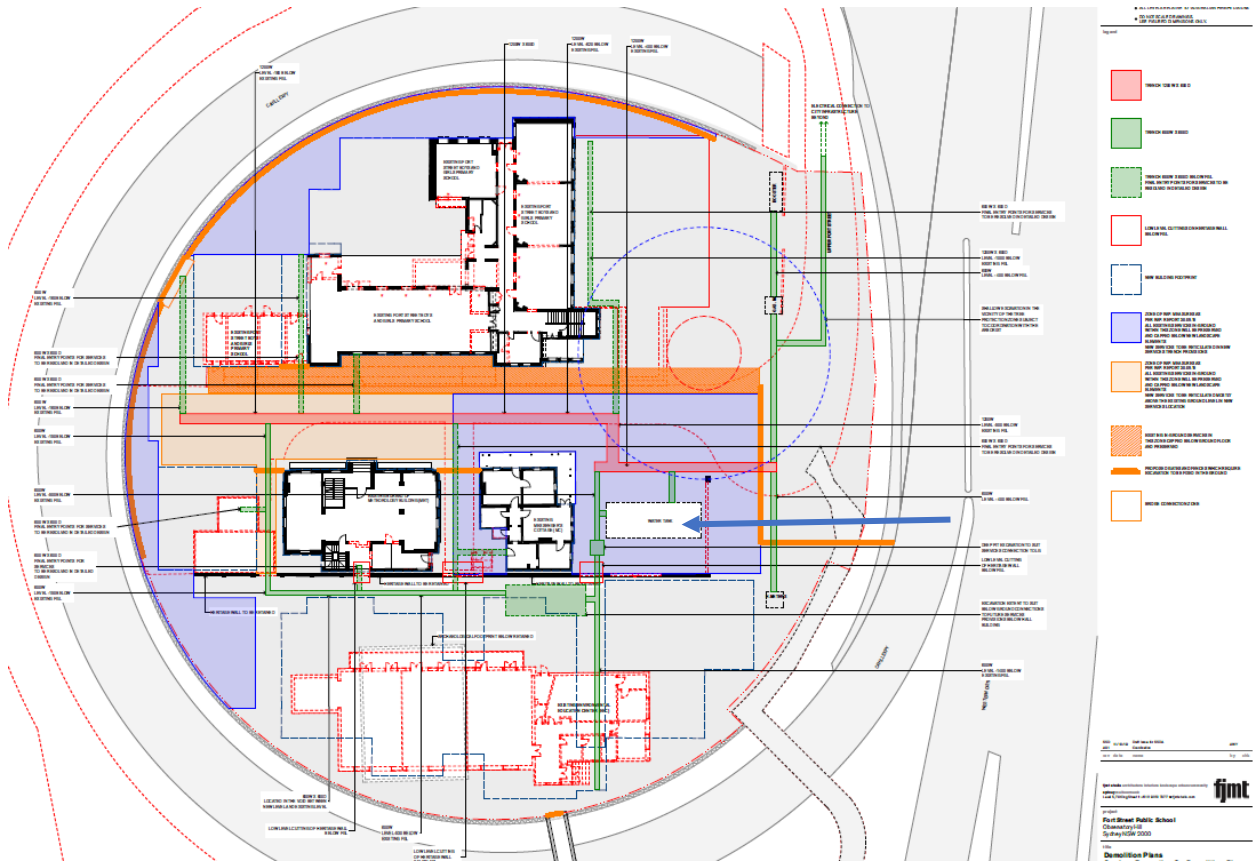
Proposed Services Plan over Demolition Plan. OSD tank shown as white rectangle (indicated) (Source: FJMT DWG DA-2105, 18.10.19)
